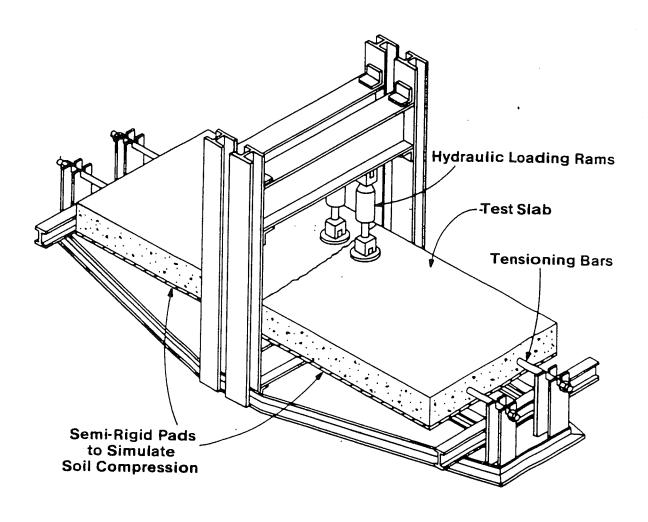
Isometric sketch of the accelerated pavement load test frame.
